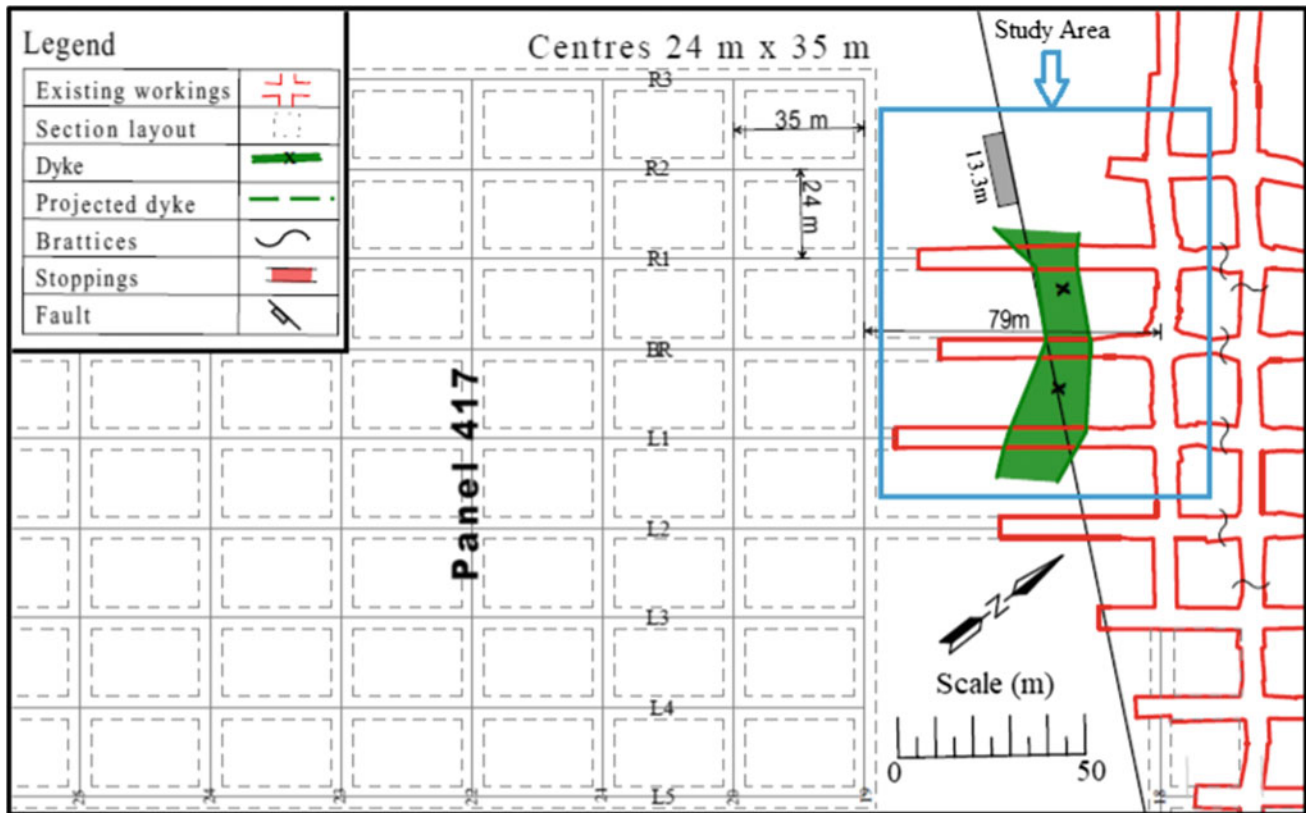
Section plan indicating the study area, Section 1, Panel 417
